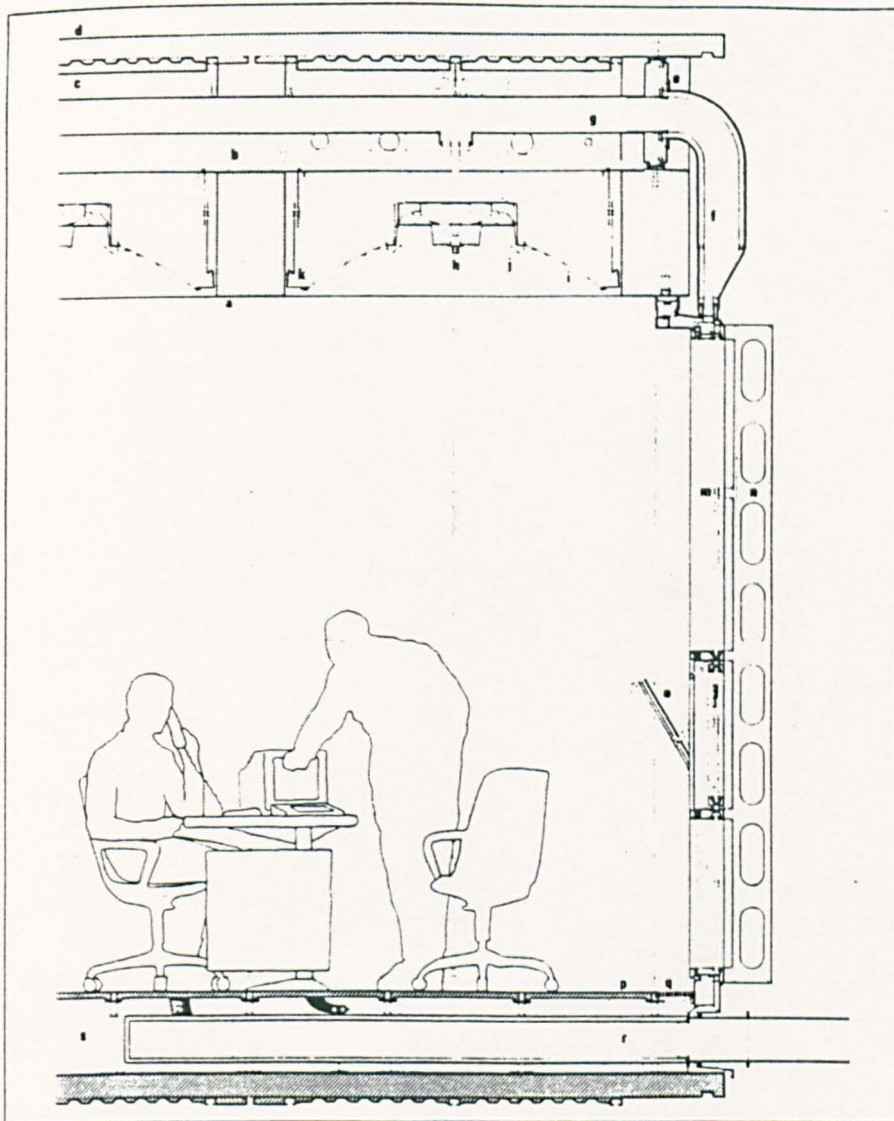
Richard Rogers Partnership, Lloyd's of London building. Section through typical office showing services arrangements in floor and ceiling. a. concrete beam; b. services void; c. steel formwork with acoustic panel; d. 100 mm concrete slab; e. aluminium sandwich panel; f. 'fish tail' extract duct; g. extract air through light fittings; h. sprinkler head; i. black luminaire shield; j. aluminium light spill ring; m. aluminium cladding with triple glazing and ventilated cavity; n. aluminium wind bracing fin; o. double glazed openable window; p. steel floor tile on pedestals; q. aluminium air grille; r. insulated supply-air duct; s. floor plenum
